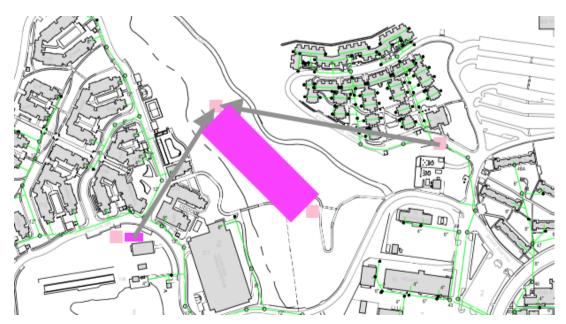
Proposed Site with Poly Canyon Village on the Left, and Cerro Vista Apartments on the Right
